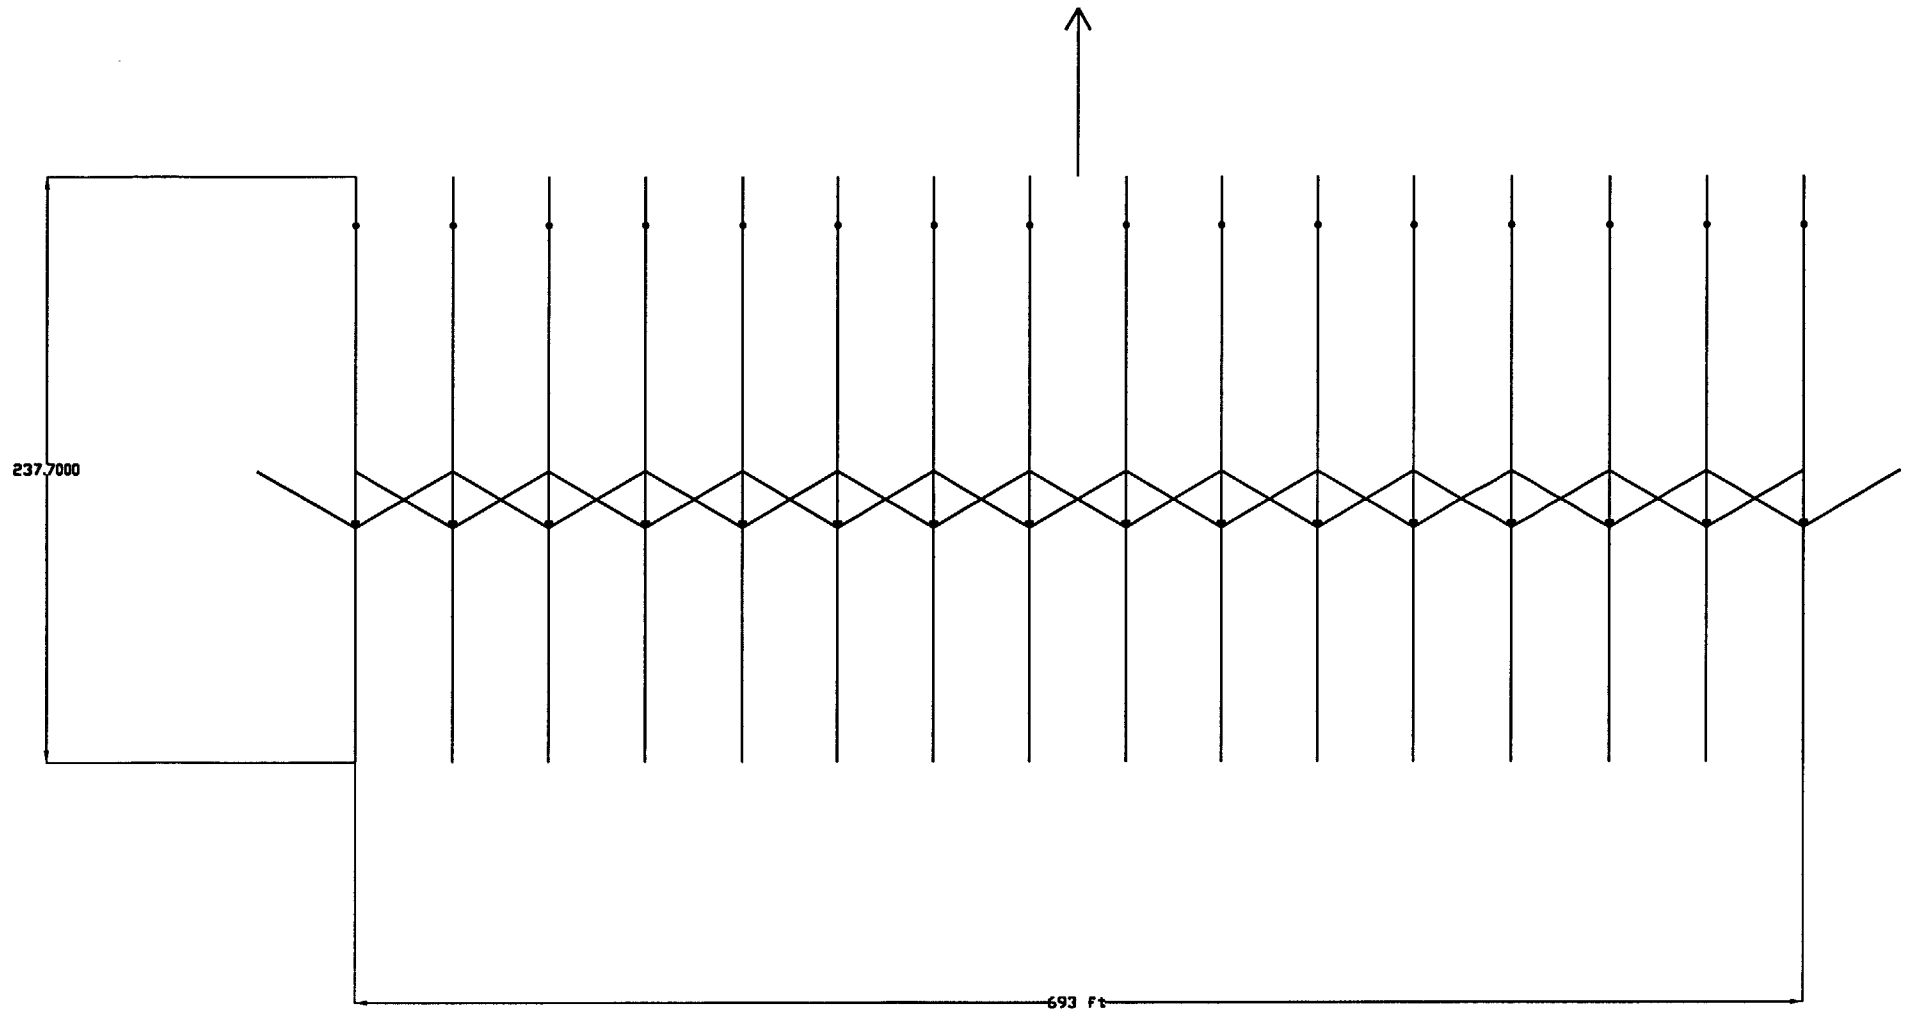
, 16 ELEMENT ANTENNA ARRAY, PLAN VIEW
